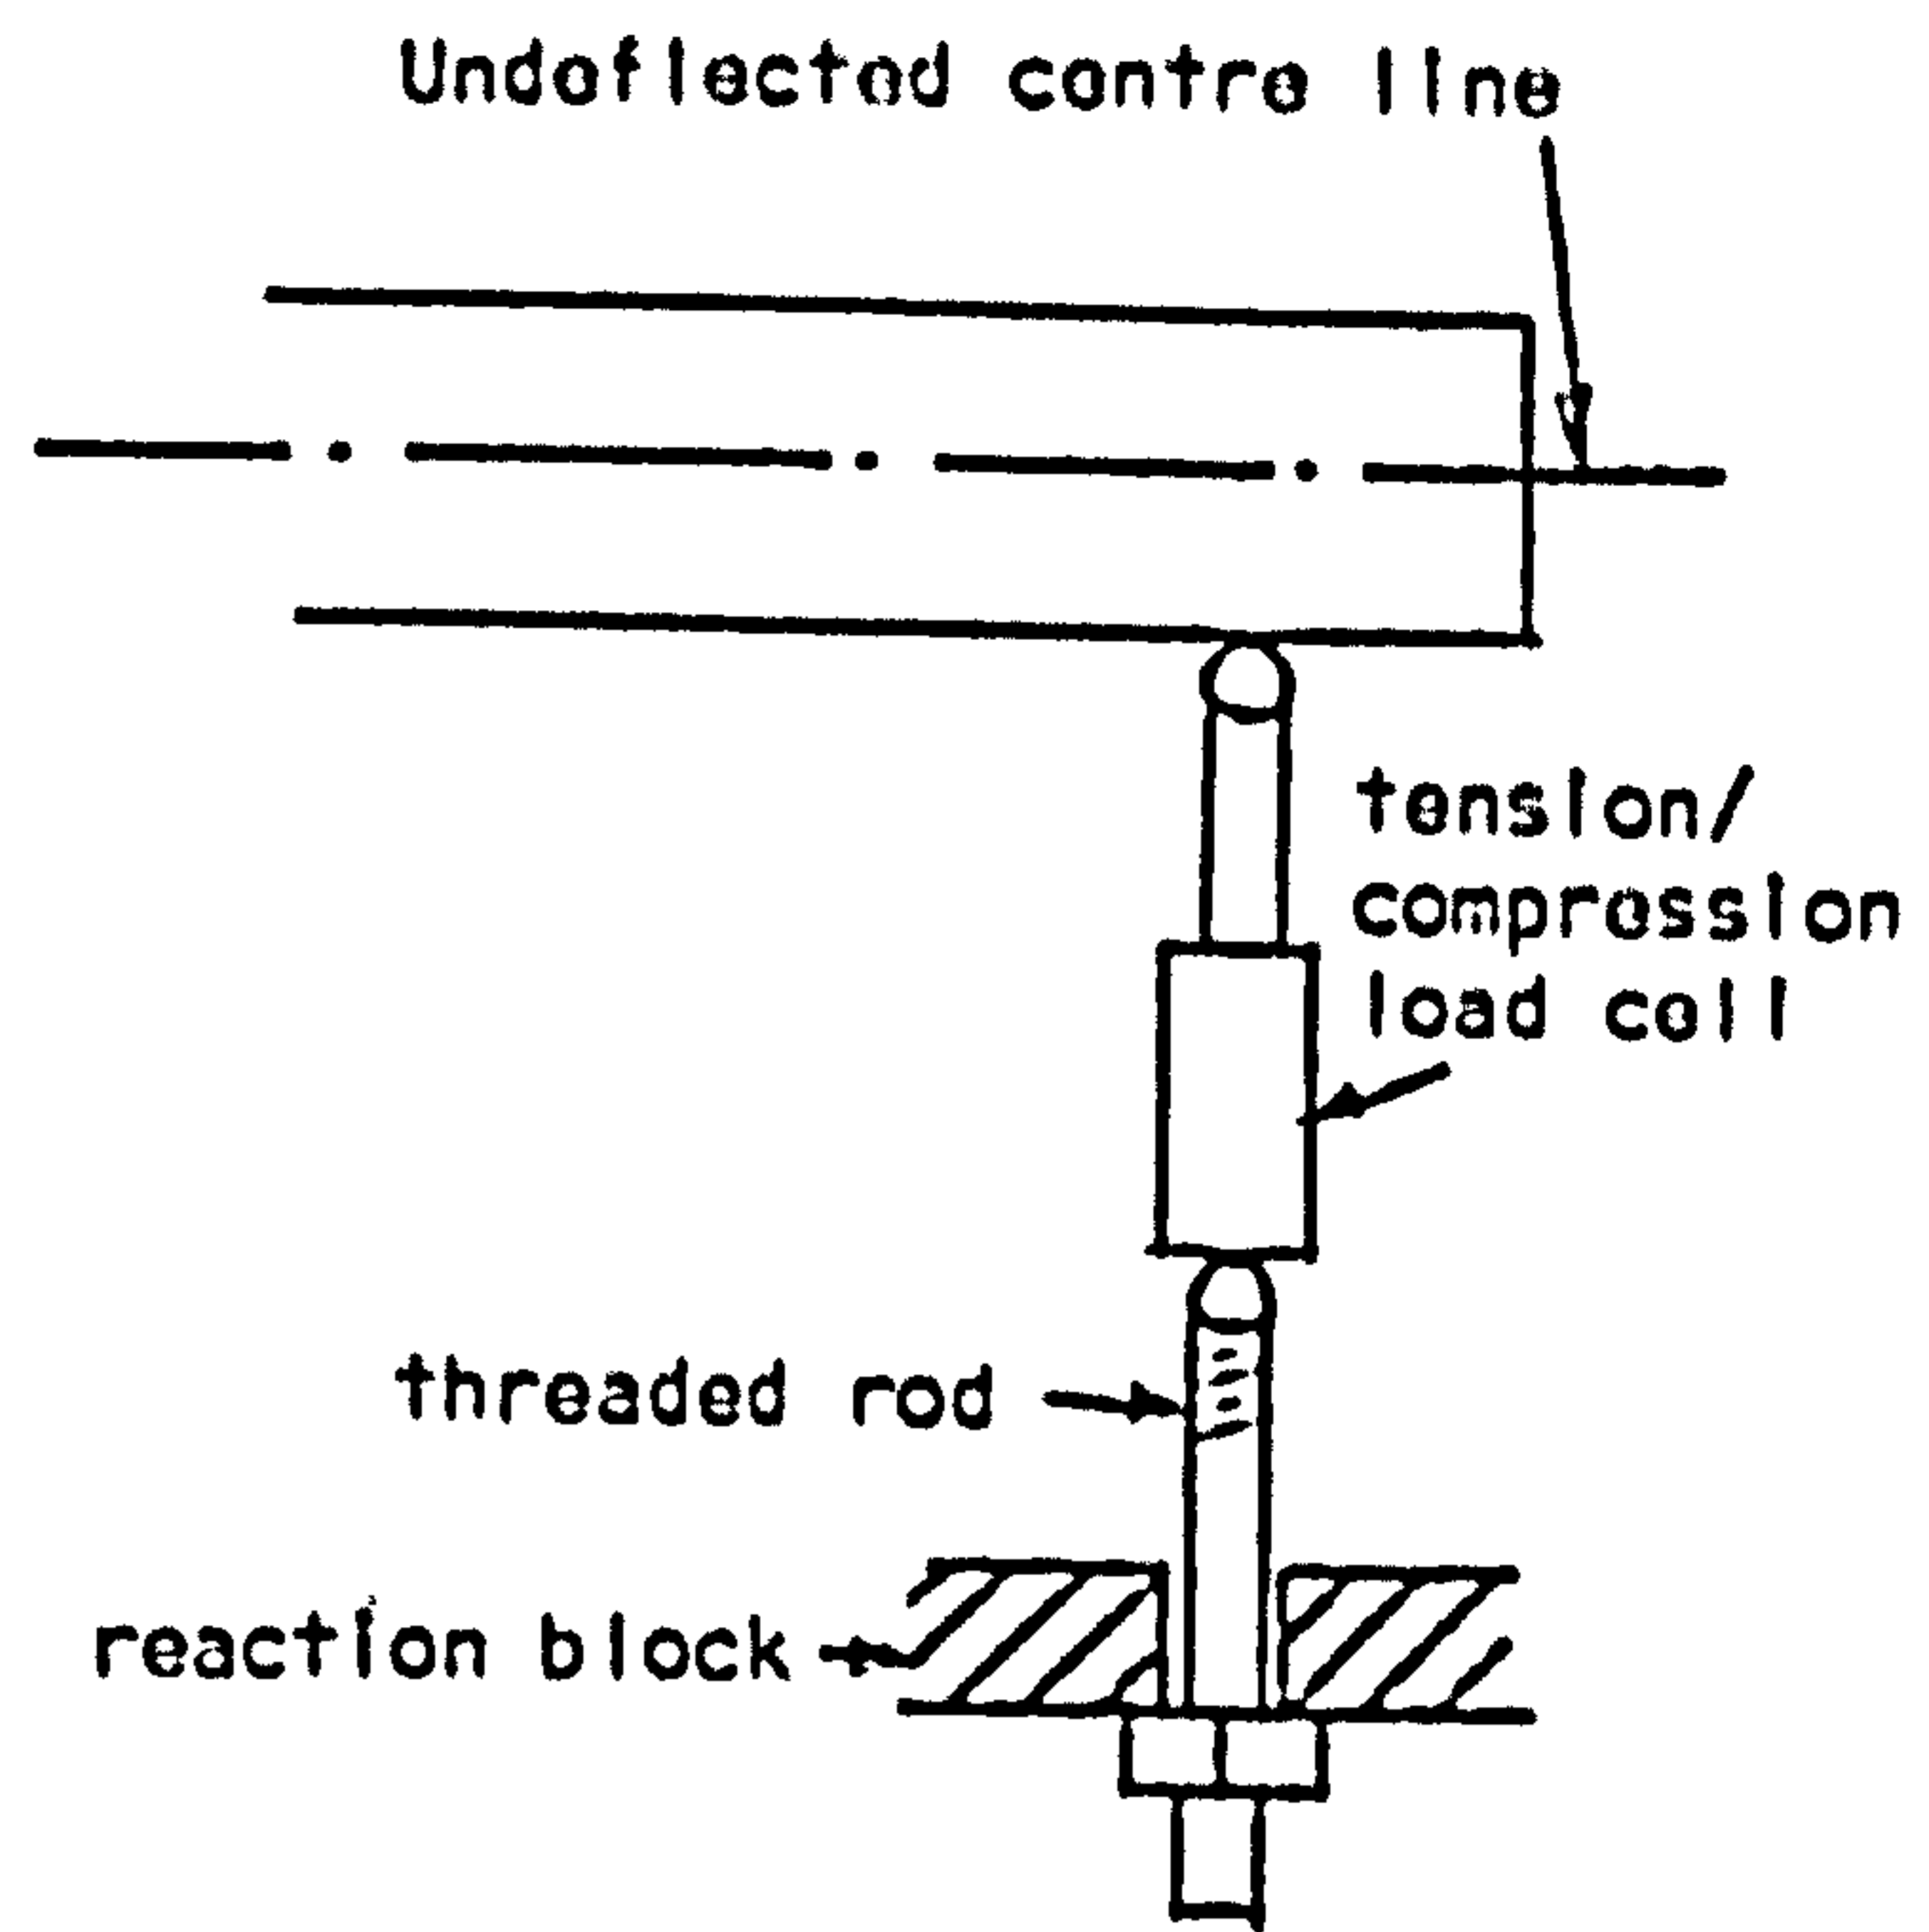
DETAILS OF BEAM LOAD AND RESTRAINT SYSTEM
